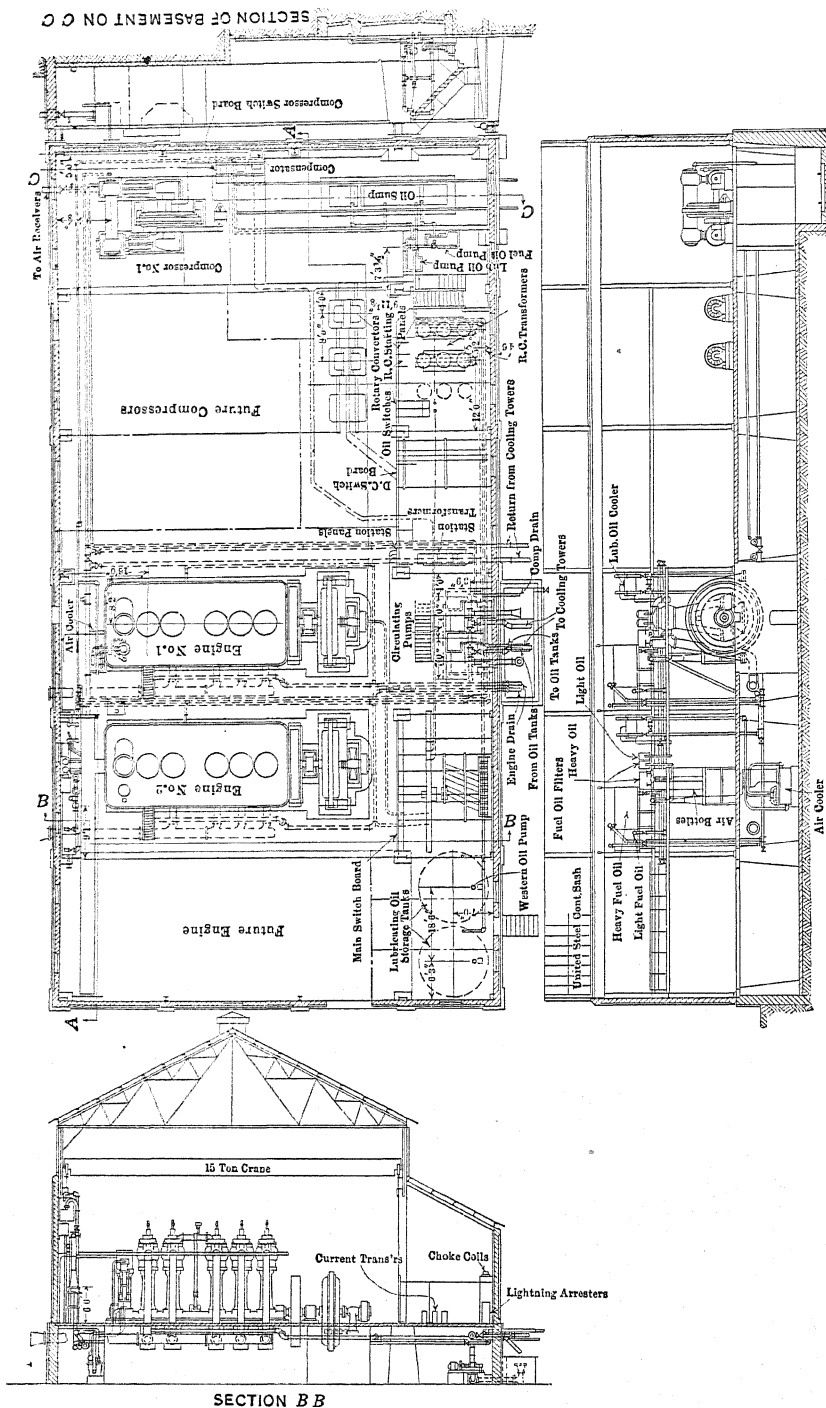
GENERAL ARRANGEMENT OF POWER PLANT OF BURRO MT. COPPER CO.
